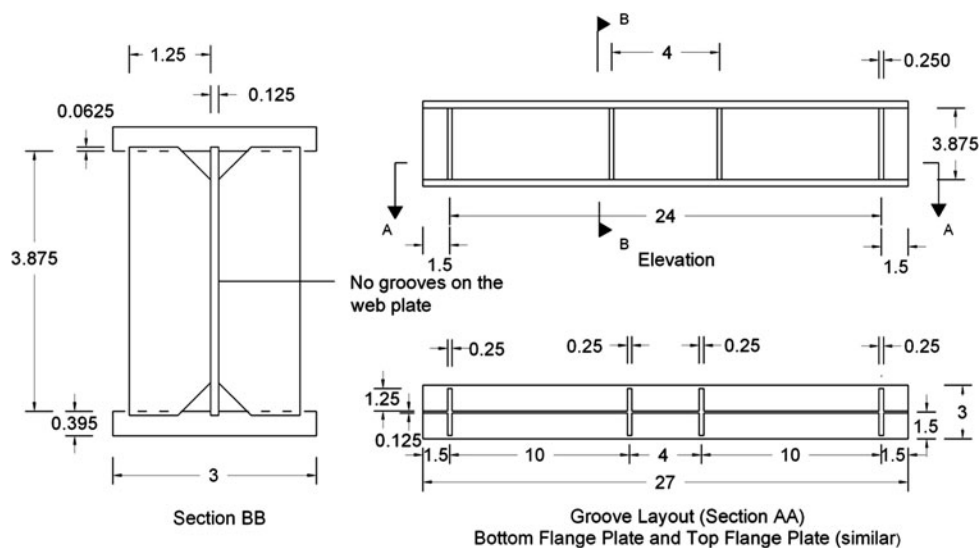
Details of the built-up welded titanium test Beam B5 (test Beam B6 is similar, but with a total beam height of 4.79 in. and without grooves) [All dimensions are in inches (1 in. = 25.4 mm)]
